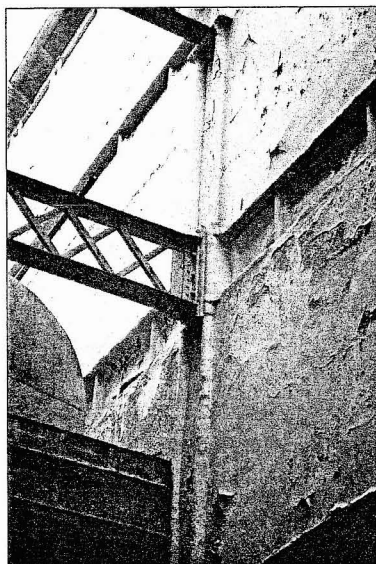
The Market Street Store, Guinness Brewery, Dublin (1904). Interior view of the west wall showing framework supporting masonry wall panels (Alastair Jackson).
